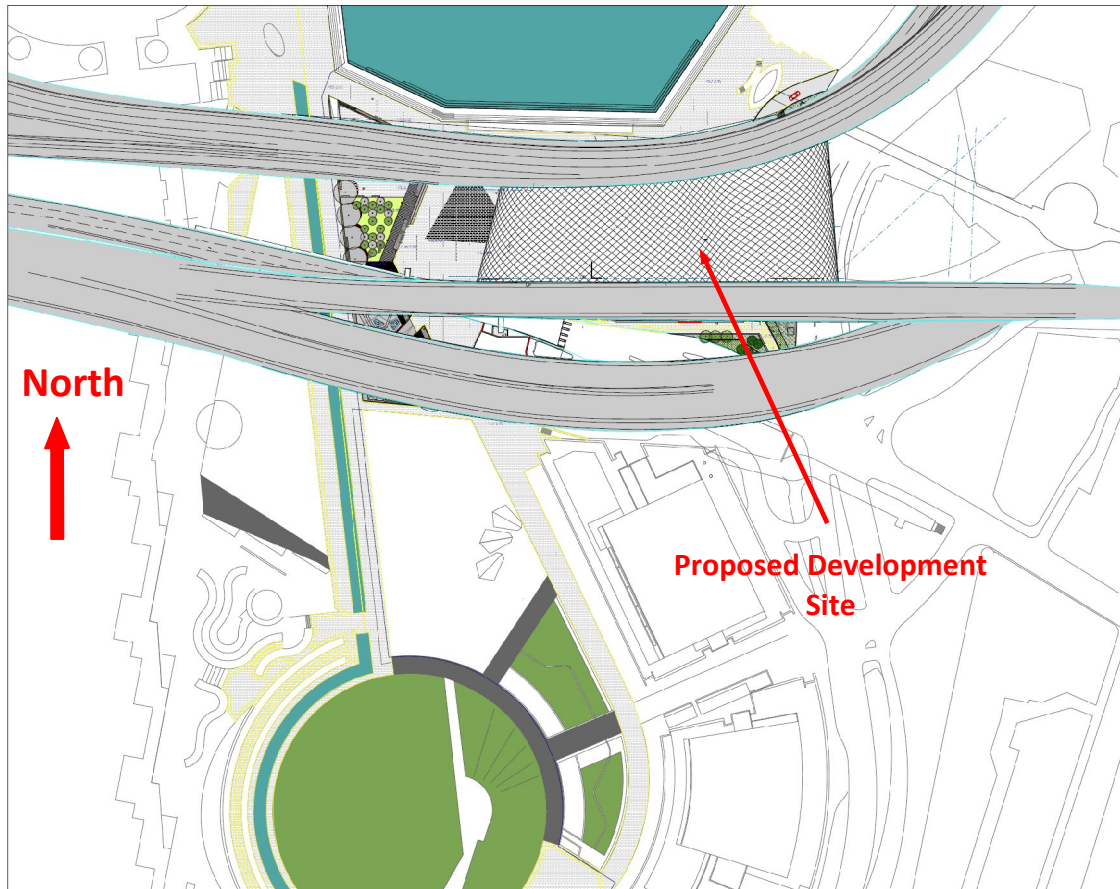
Upper Site Plan of the proposed Development at 31 Wheat Road, Sydney
